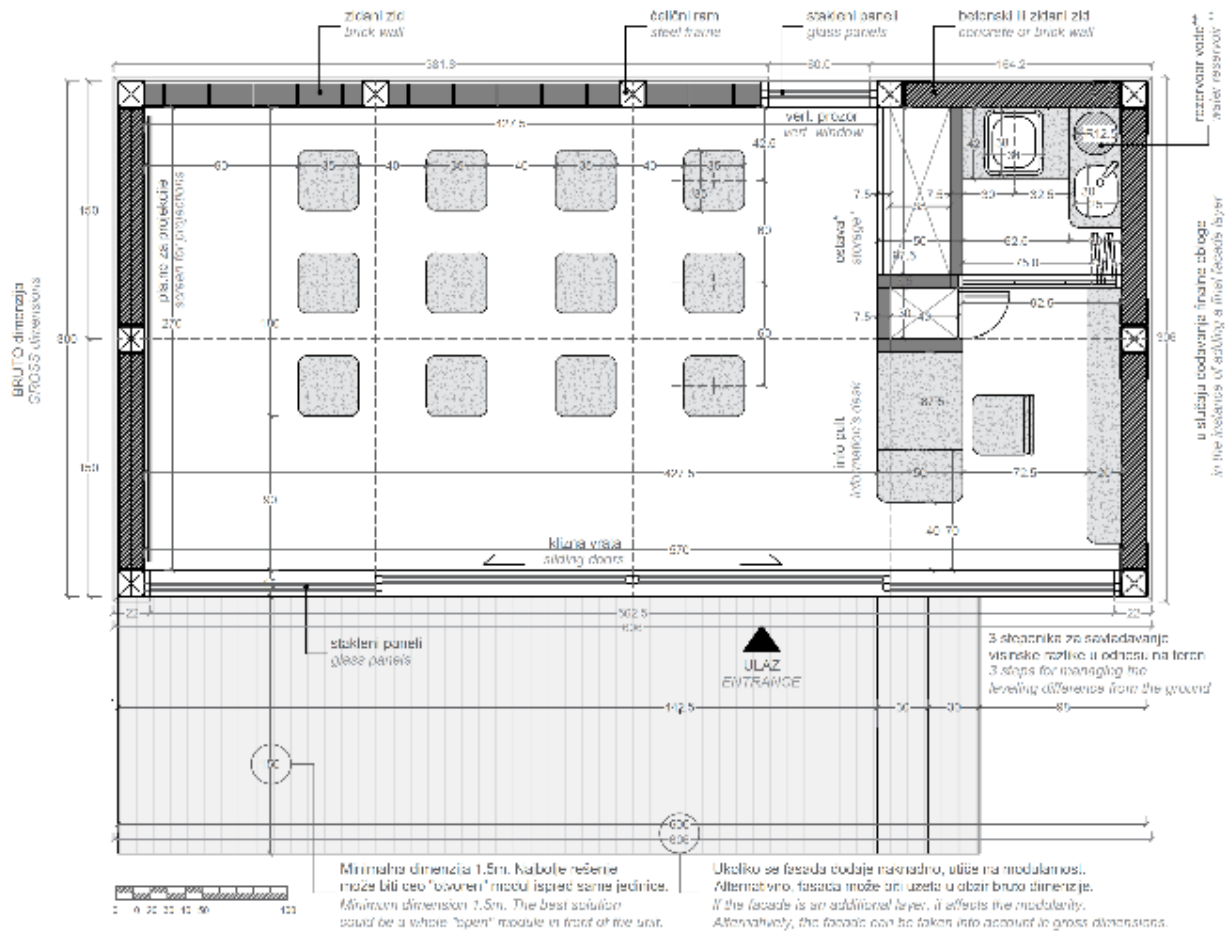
Architectural conceptual layout of 3R Pilot house
